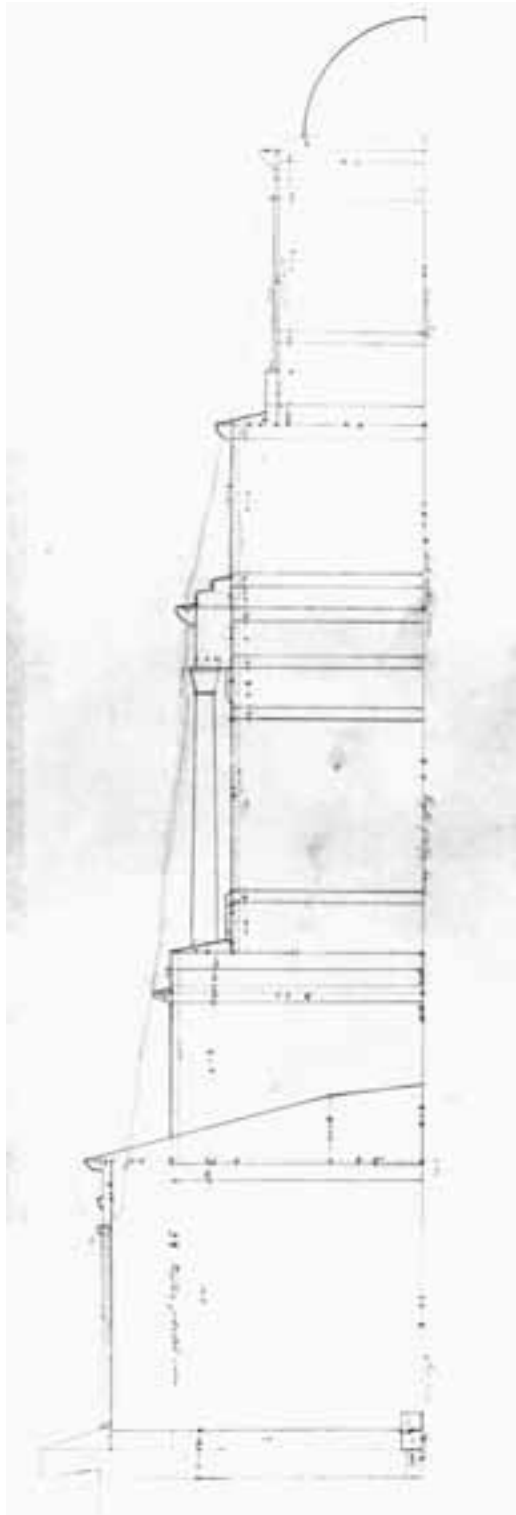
(Above left) Half-Sectional View of Tower Structure, drawing, 1840s, William Weeks, LDS Church Archives.
